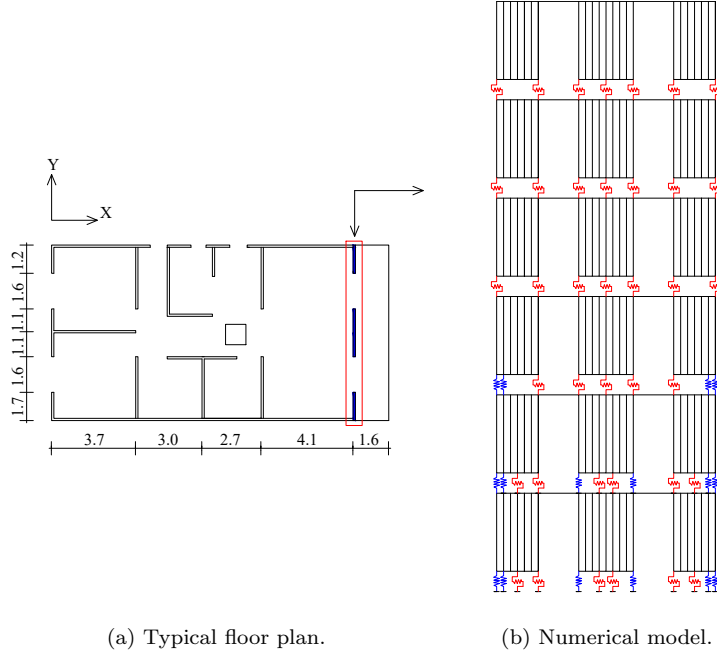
Plan view and the elevation of OpenSees model of the SOFIE building.
